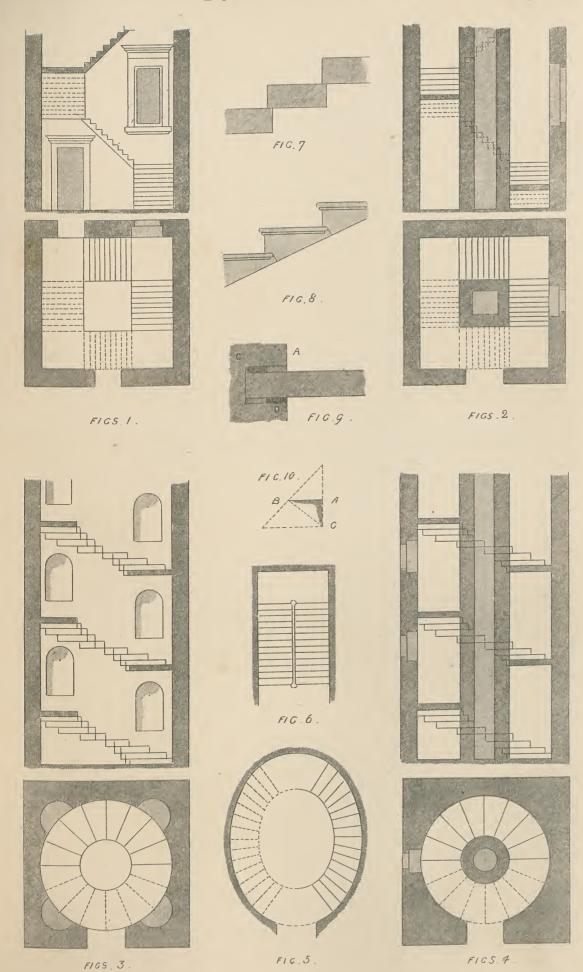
, are a plan and section of an open newelled staircase, square on plan, lighted at the side, and also by a skylight above.
